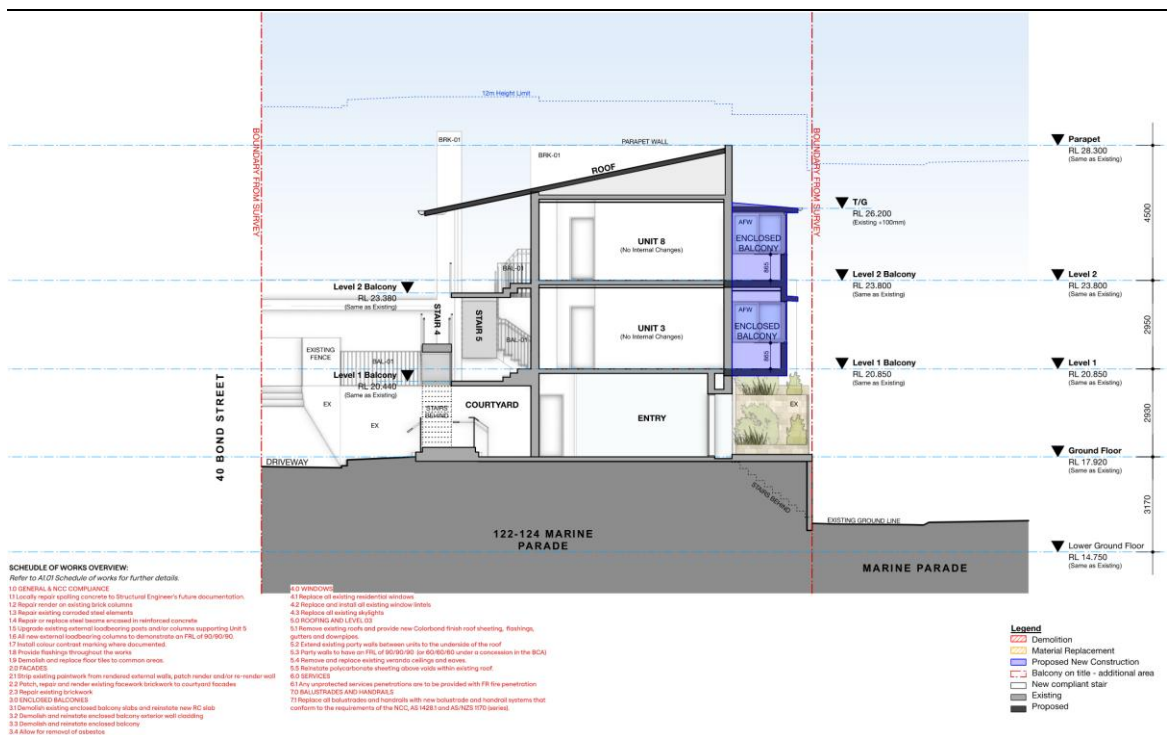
Proposed Cross Elevation (Source: Hill Thalís – 05/12/2025)
